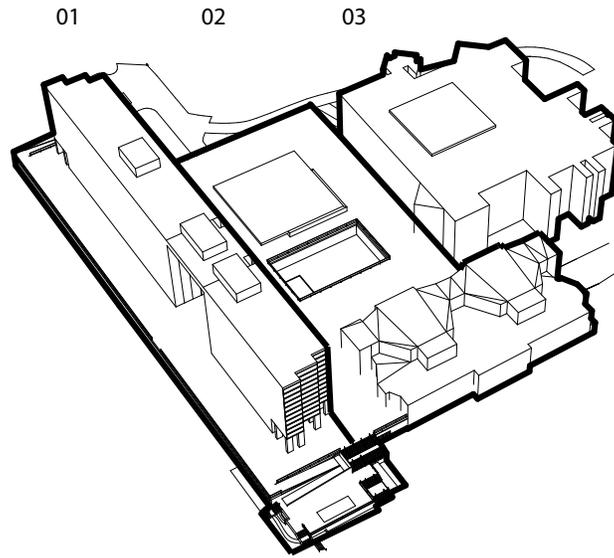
Dividing the Existing Building, central square separating from the scott library
